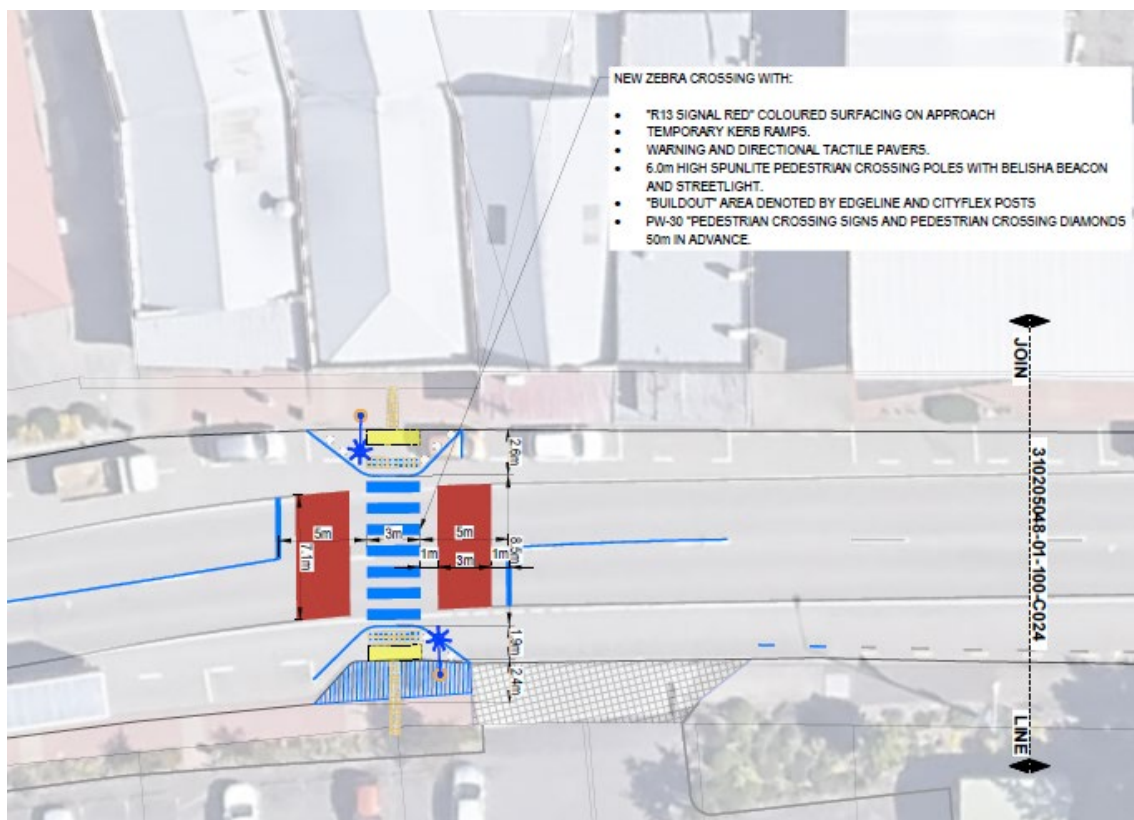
Proposed new pedestrian crossing outside Butchery
